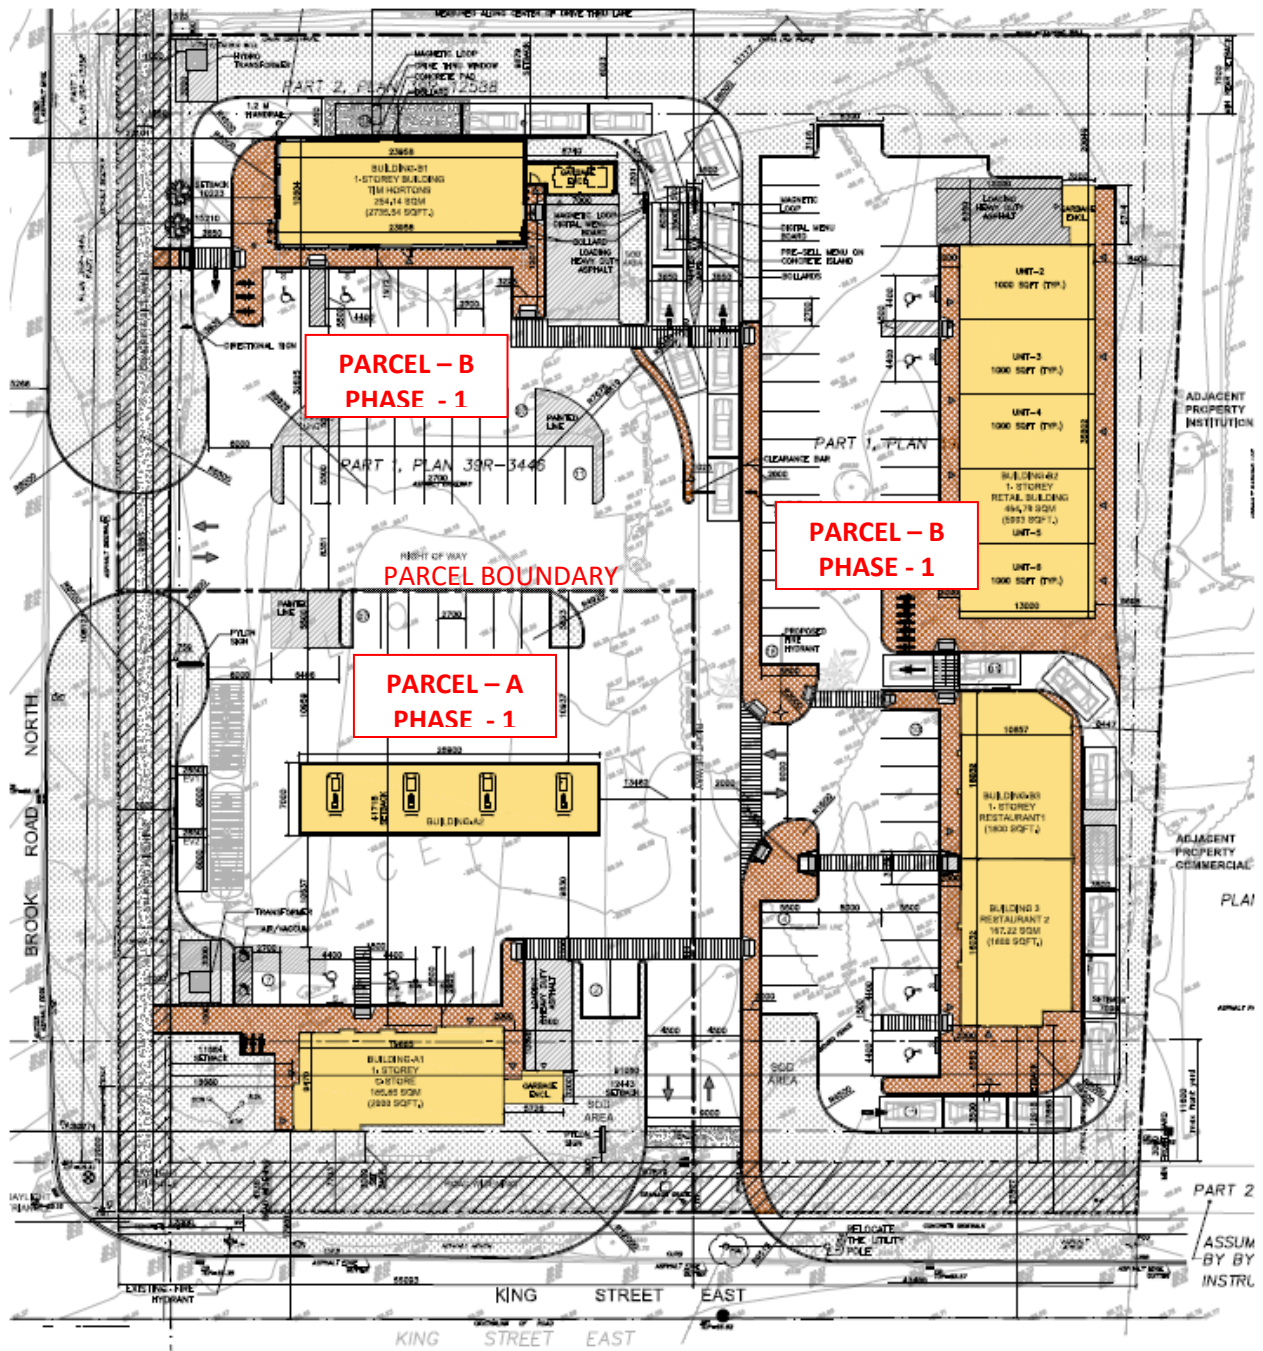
PROPOSED DEVELOPMENT PLAN
